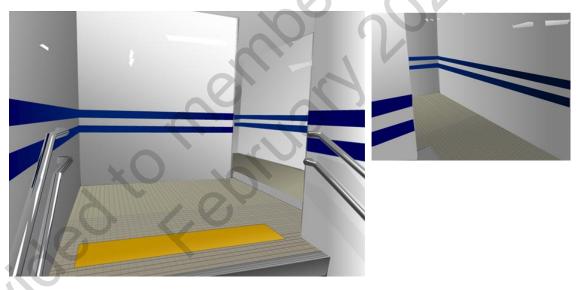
An irregular entrance to a washroom surrounded by striped walls (illustrated by Yukio Akashi)
